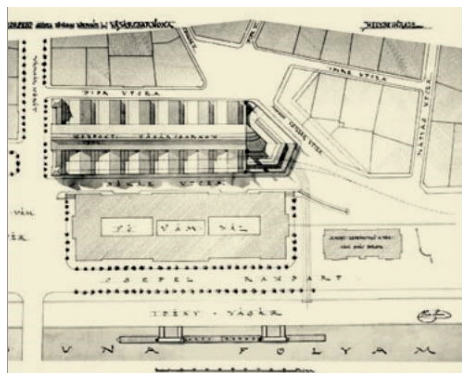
Central Market Hall in Budapest – site plan (source: [22])
